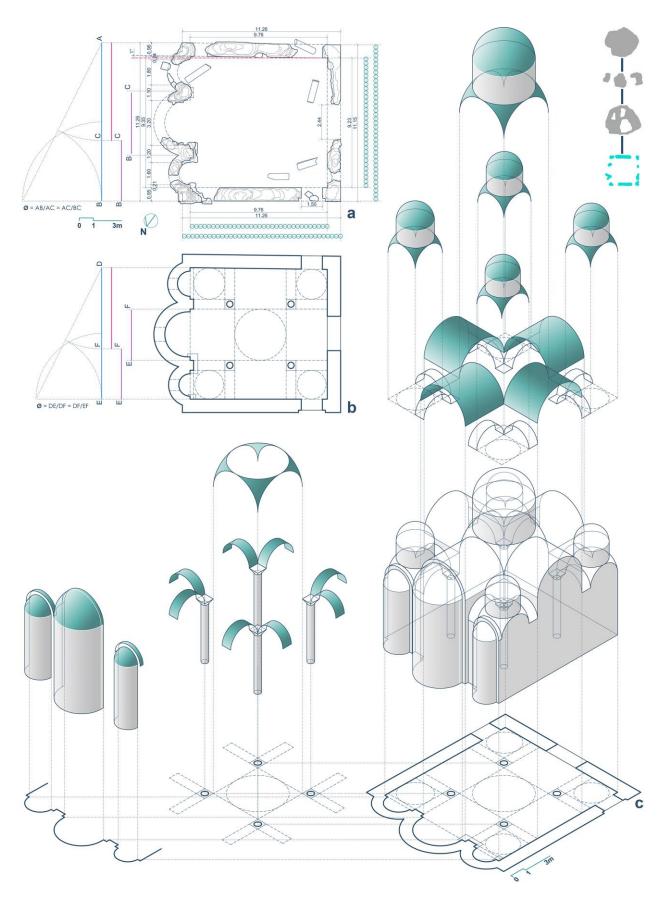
Church of San Giorgio in Pietra Cappa: a) survey restitution plan with modular subdivision according to Byzantine foot;b) plan with original configuration hypothesis; c) spatial configuration hypothesis. Drawing by Domenico Mediati.
